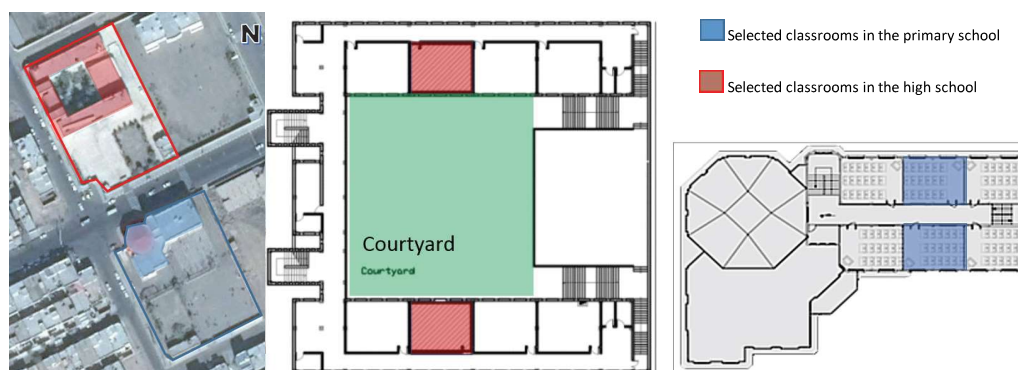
Left: location and orientation of the schools (Image from Google Earth). Fig 2. Middle: high school floor plan. Fig 3. Right: primary school floor plan
